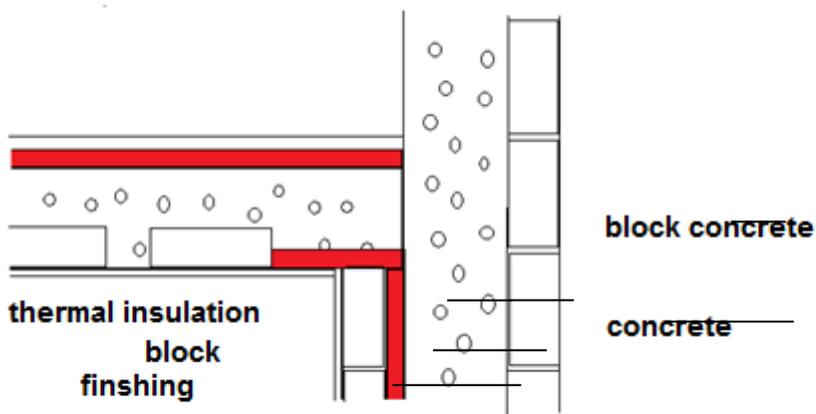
Installation of thermal insulation at the concourse of the walls with external ceiling (Alaaysh, 1990)
